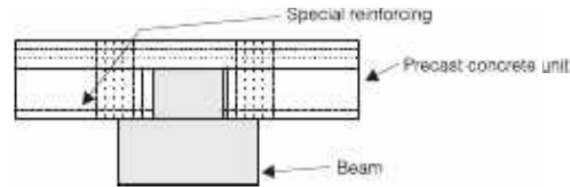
Alternate continuous reinforcement through the beam at the level of bottom of floor and in the topping of slab floor to support precast concrete floor units.
